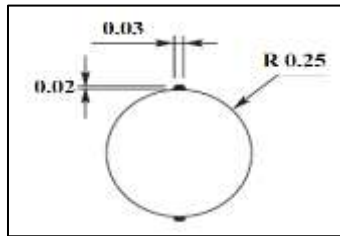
Cross sectional dimensions of spindle shaped Tensairity beam
